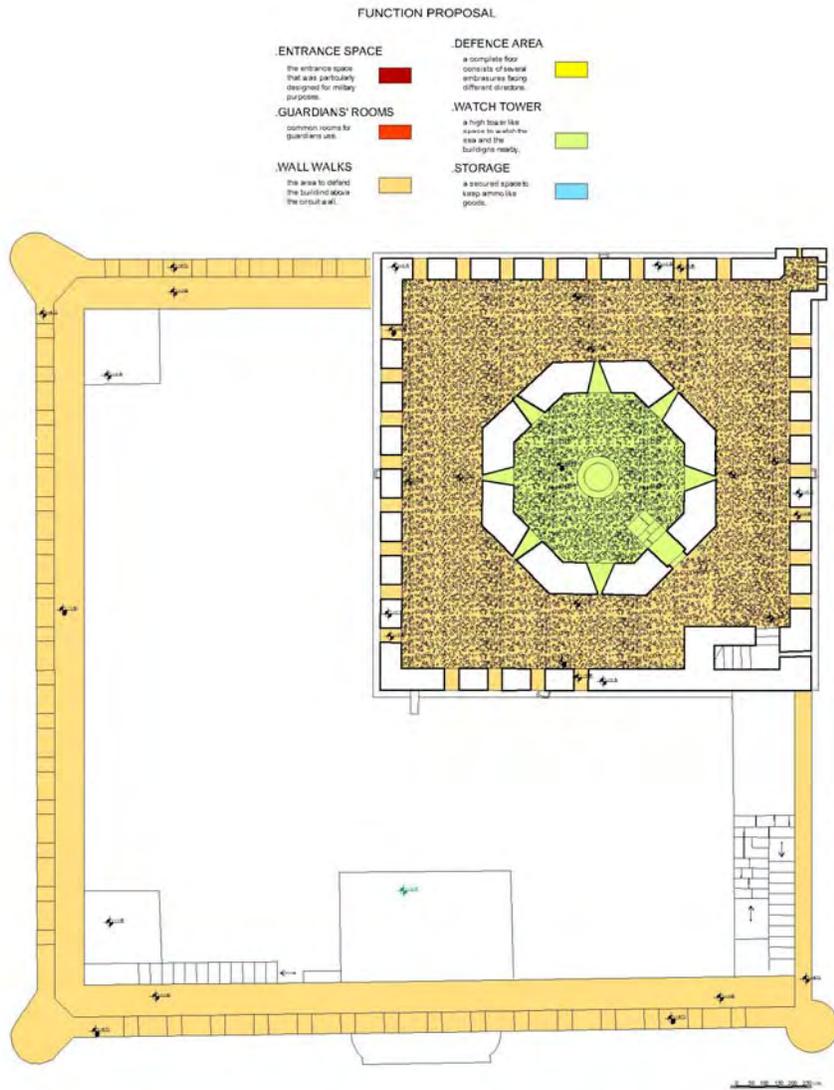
2<sup>nd</sup> Floor Plan – Distribution of the Original Functions of the Spaces.
